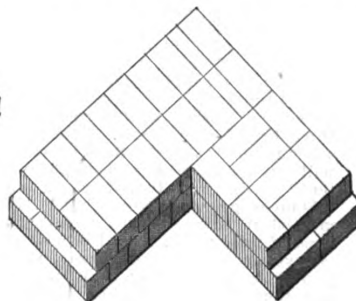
Interior Angle of Wall Two Bricks in Thickness.
